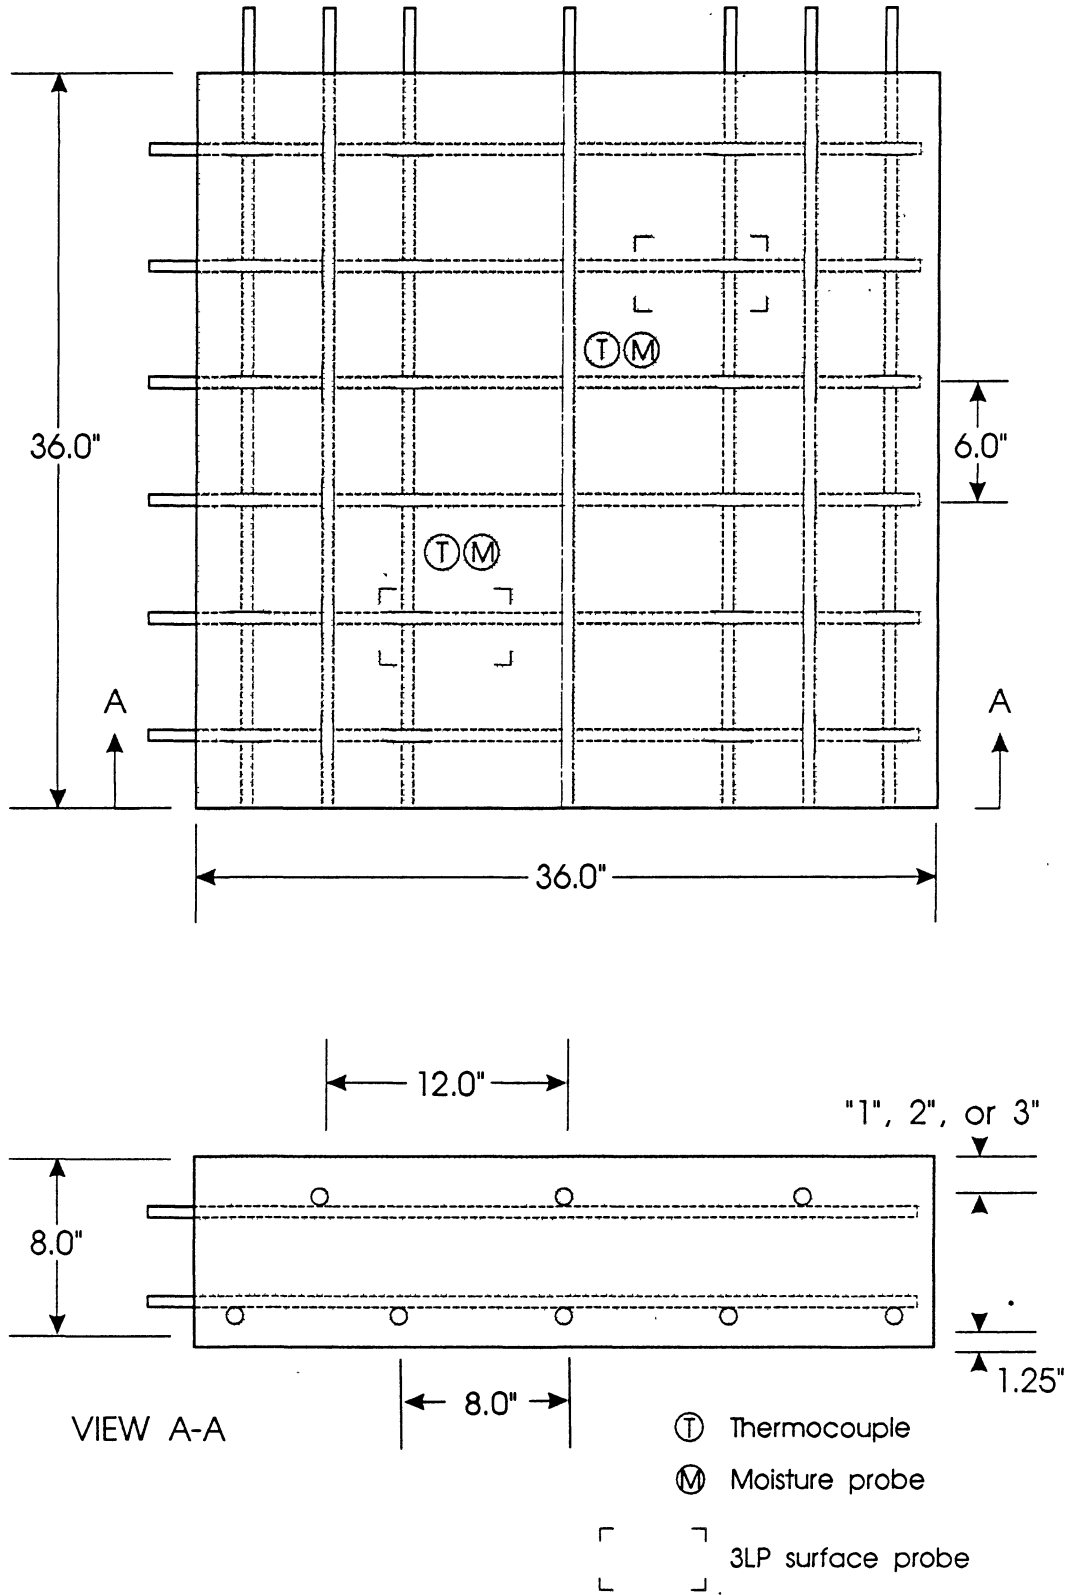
Outdoor exposed concrete slabs used to monitor the variation of rebar corrosion rates with the seasons.
